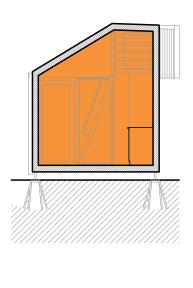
TINY HOUSE UNIT PLAN AND SECTION
